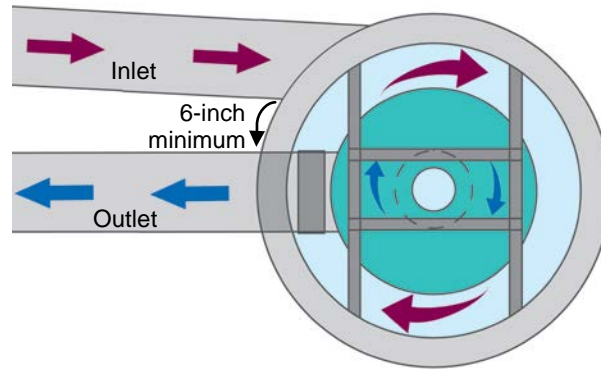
Inlet Crown of the Downstream Defender Set at the Same Elevation as Outlet Pipe Invert
